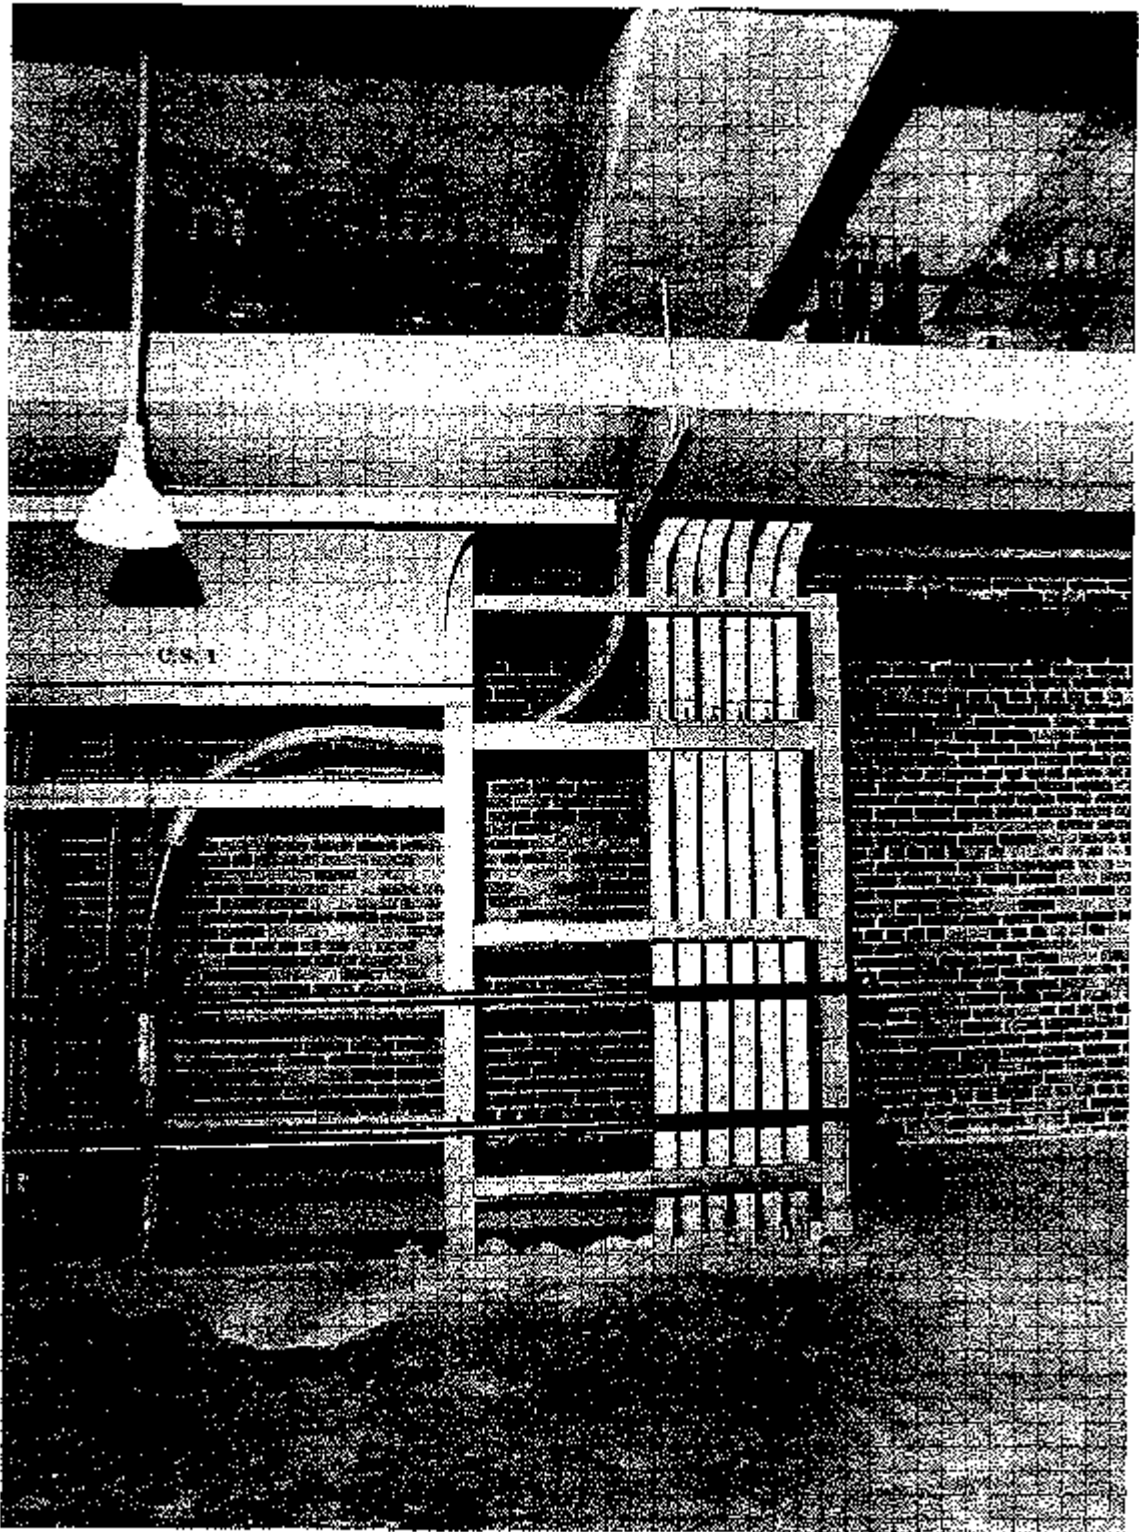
K-707 Auxilliary Switch House Upper Floor Cable Spreader Room
